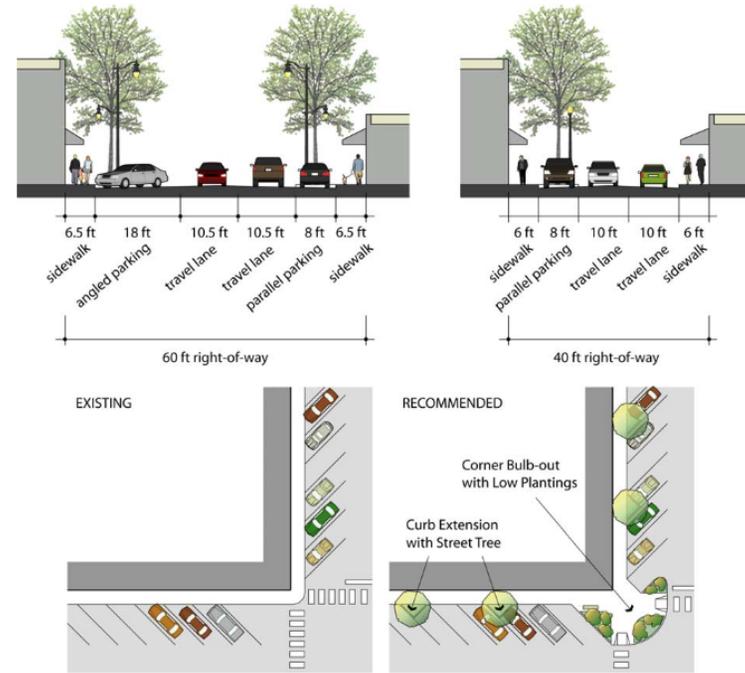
Streetscape Improvements. Curb extensions and corner bulb-outs create space to add landscaping and street furniture, enhancing the walking experience without sacrificing on-street parking spaces.
